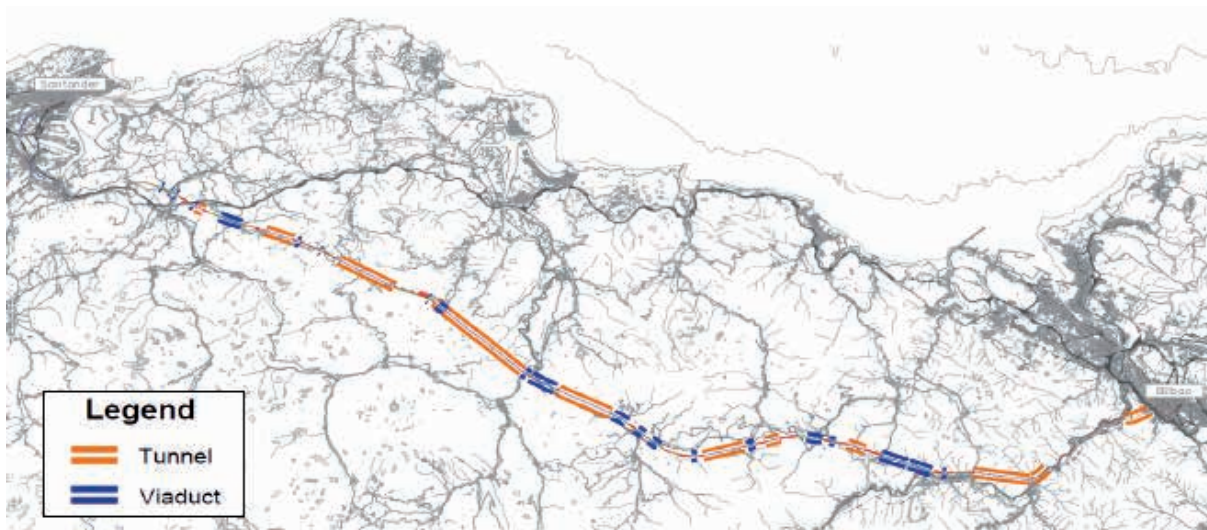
Detailed line layout with the exact tunnel and viaduct locations.
